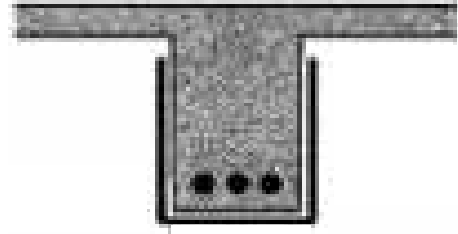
Carbon Fiber Sheet/Plate Bonding
